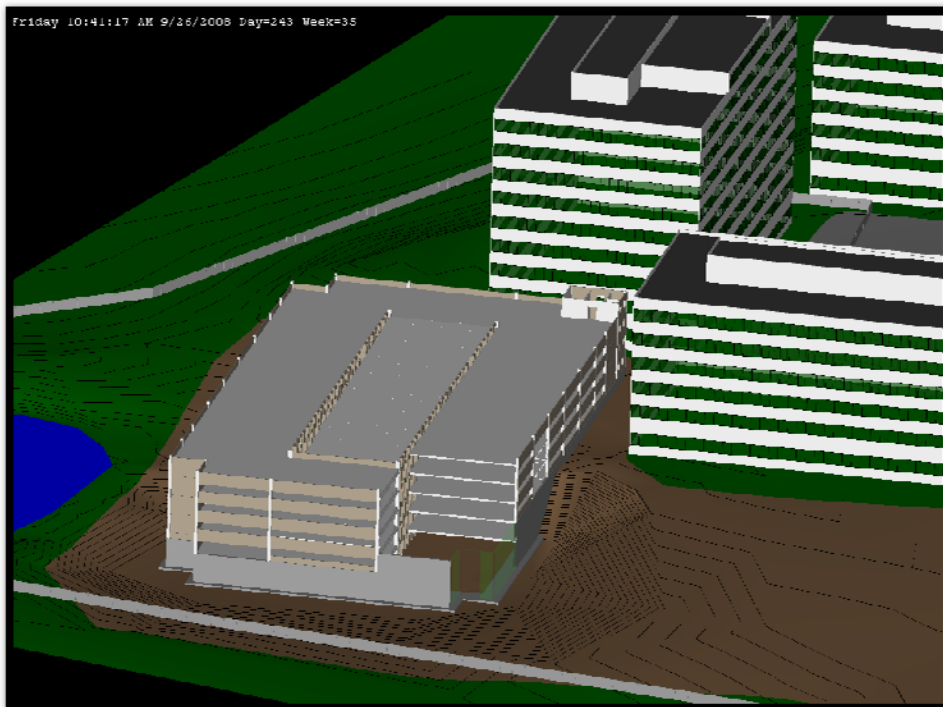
Phase 2 Footing and Foundation Wall Construction
